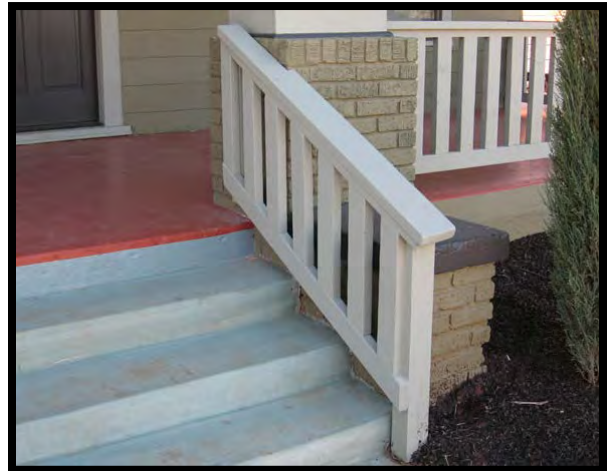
ORIGINAL RAILINGS SHOULD BE PRESERVED AND MAINTAINED. IF REPLACEMENT IS NECESSARY, NEW RAILING SHOULD MATCH THE ORIGINAL DESIGN.
